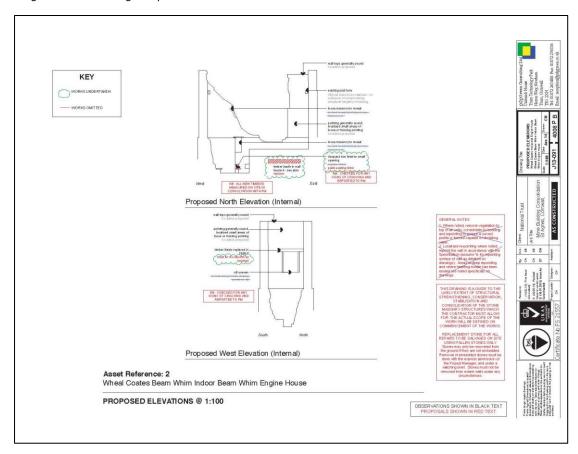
Northern and western internal elevations of Wheal Coates beam whim.
